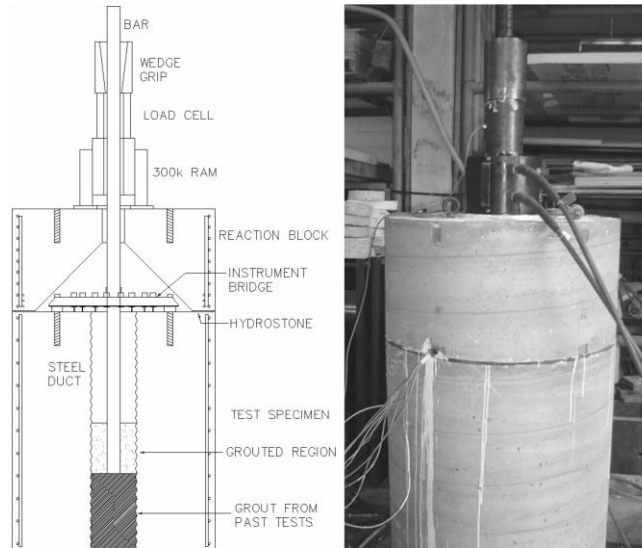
Grouted Large Bar Pullout Test Apparatus
